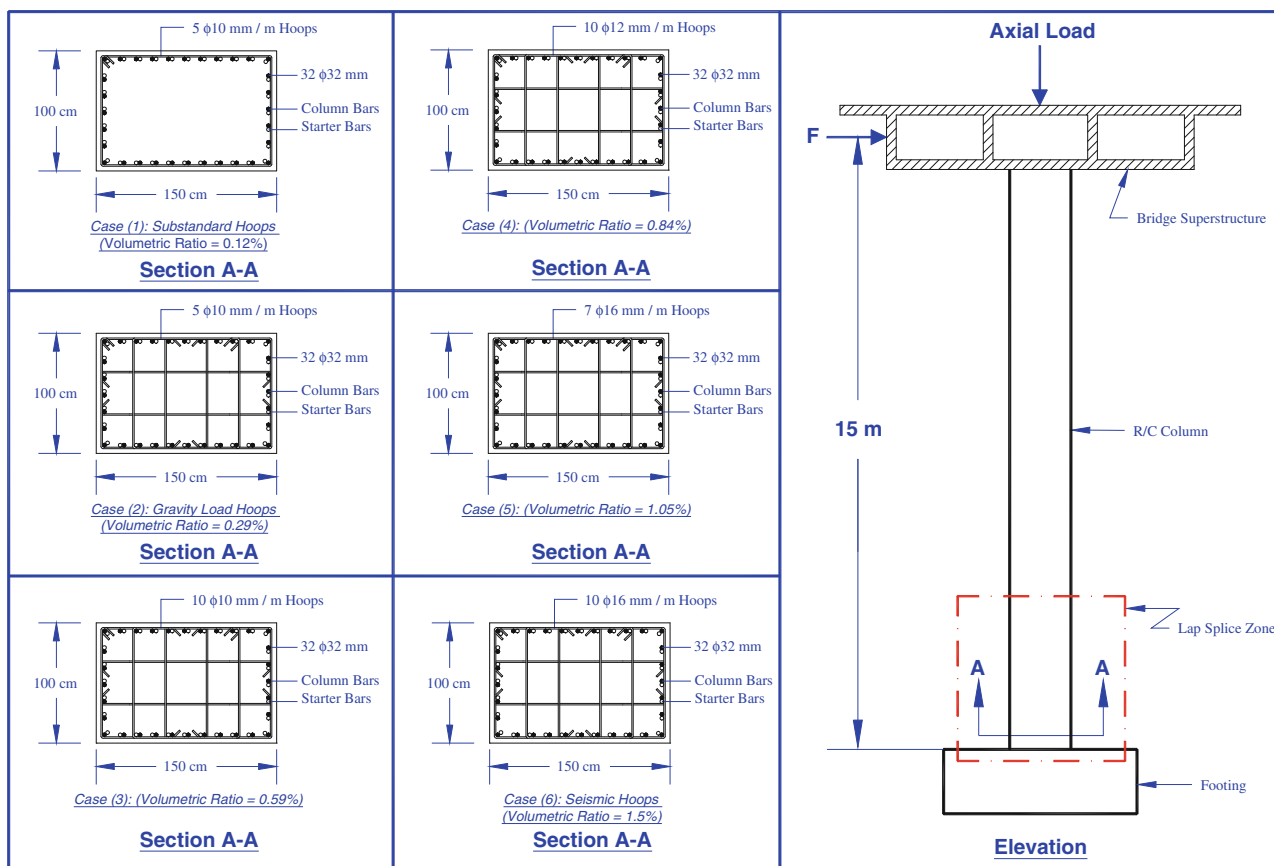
Dimensions and reinforcement details of studied bridge columns
